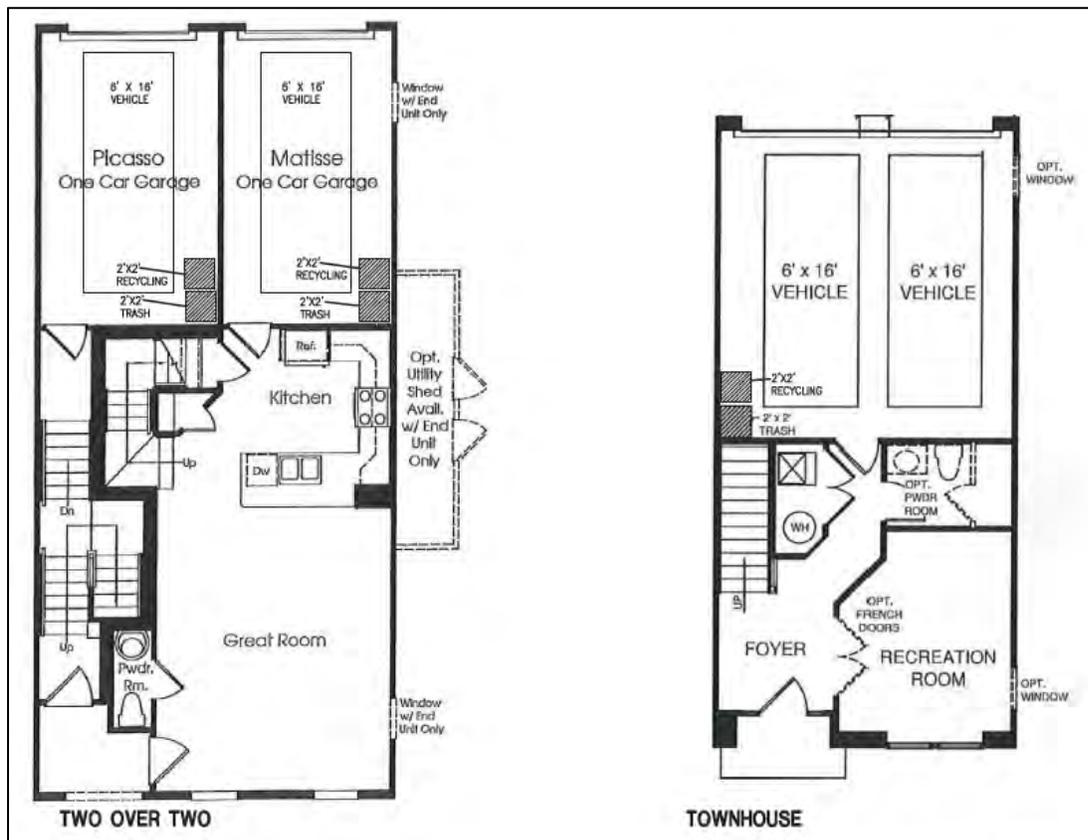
Proposed Garage Layouts and Trash/Recycling Bin Spaces
